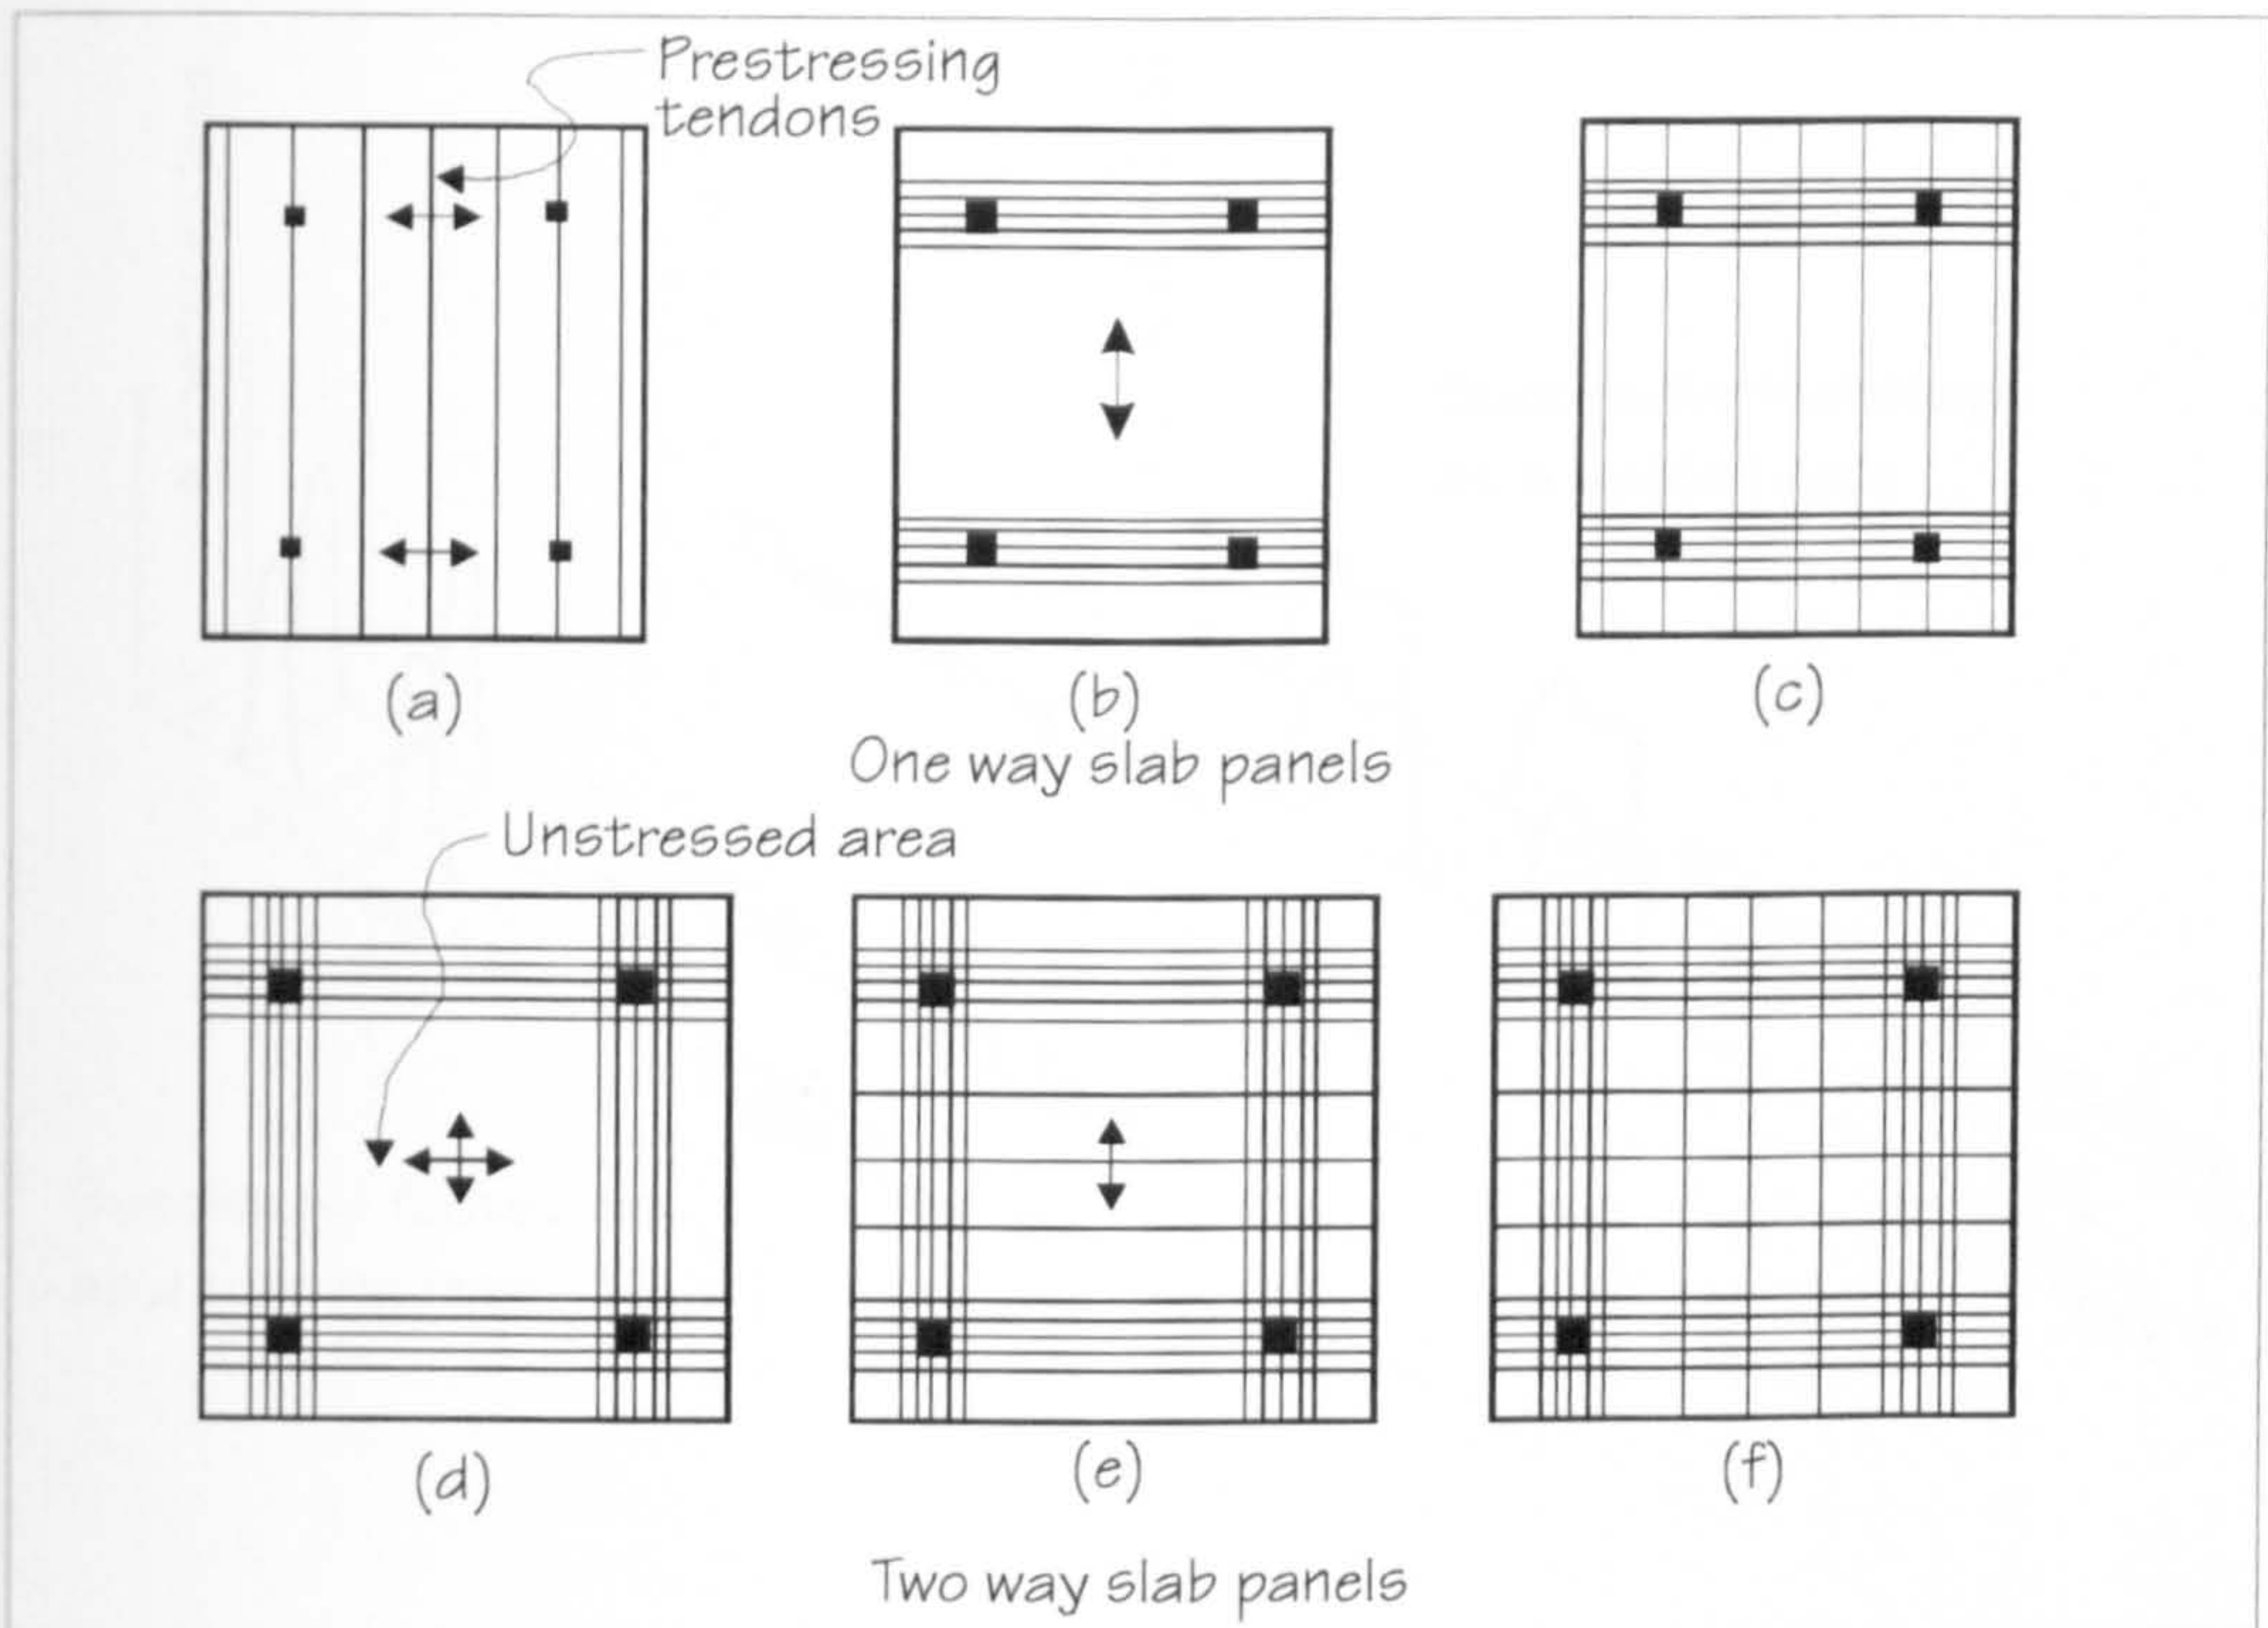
Typical prestressed post-tensioned floor panels (after Khan and Williams, 1995).
